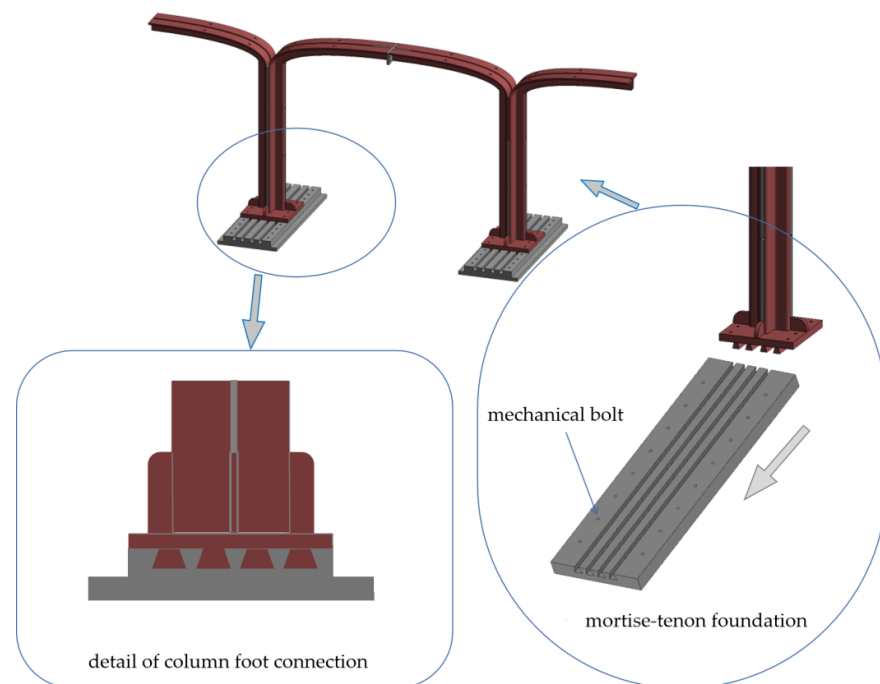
Schematic diagram of the mortise-tenon foundation and its connection.
